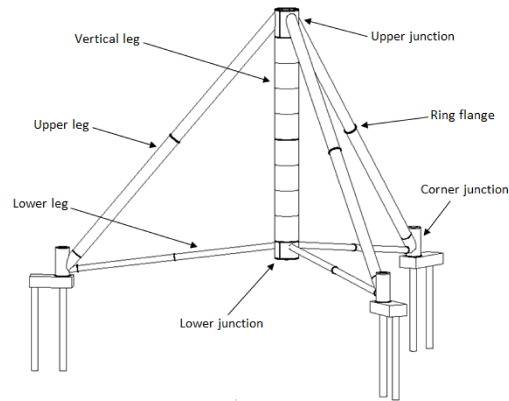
Example of a steel tripod structure used as a platform in Onshore Wind Towers.
